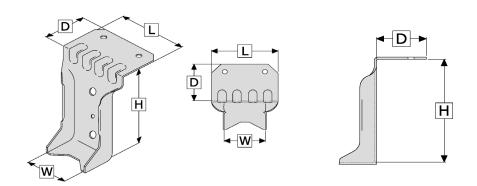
TYPICAL TF PANELIZED ROOF HANGER
